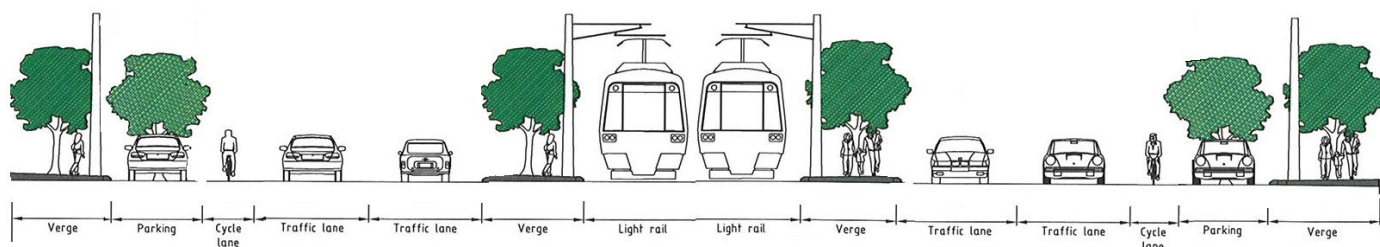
Proposed Cross Section for Stephenson Avenue and Scarborough Beach Road
